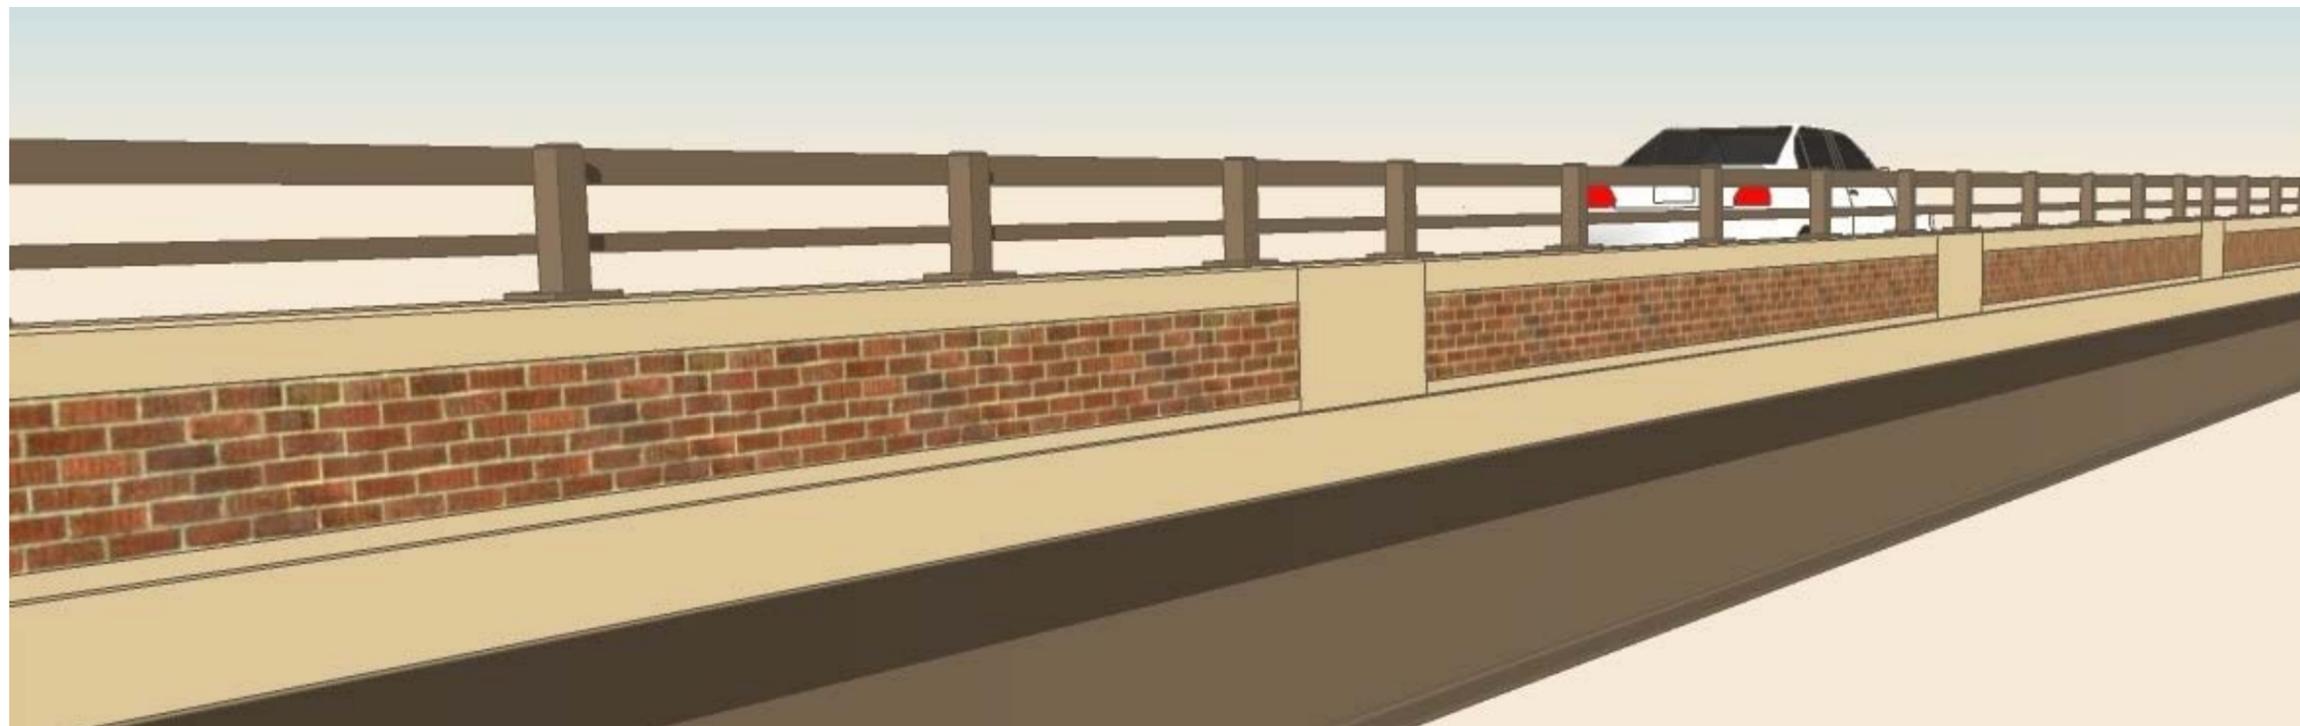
General Aesthetic Dimensions MDOT Modified B-25-Series Bridge Railing
